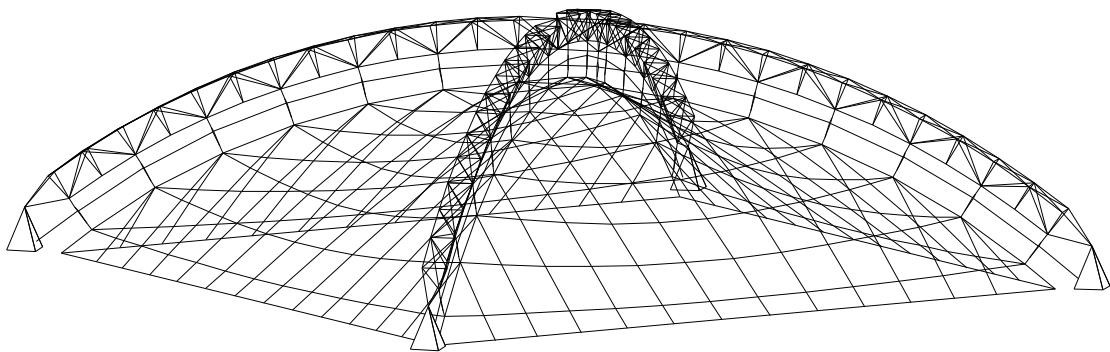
Axonometric view of model 2, cable net supported by two truss arches
